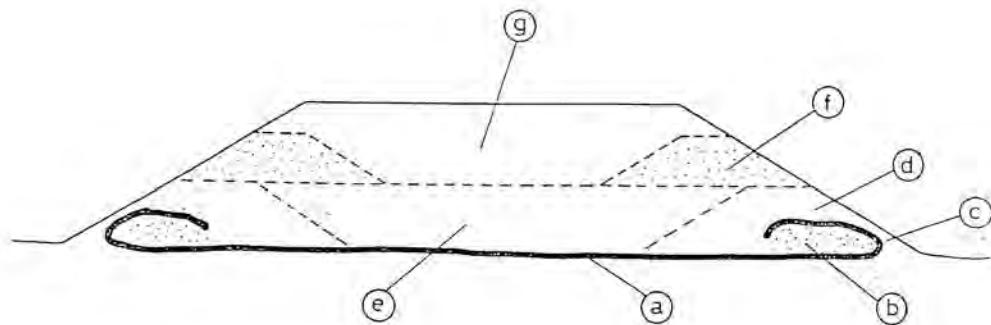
Recommended Embankment Construction Sequence (John, 1987)
